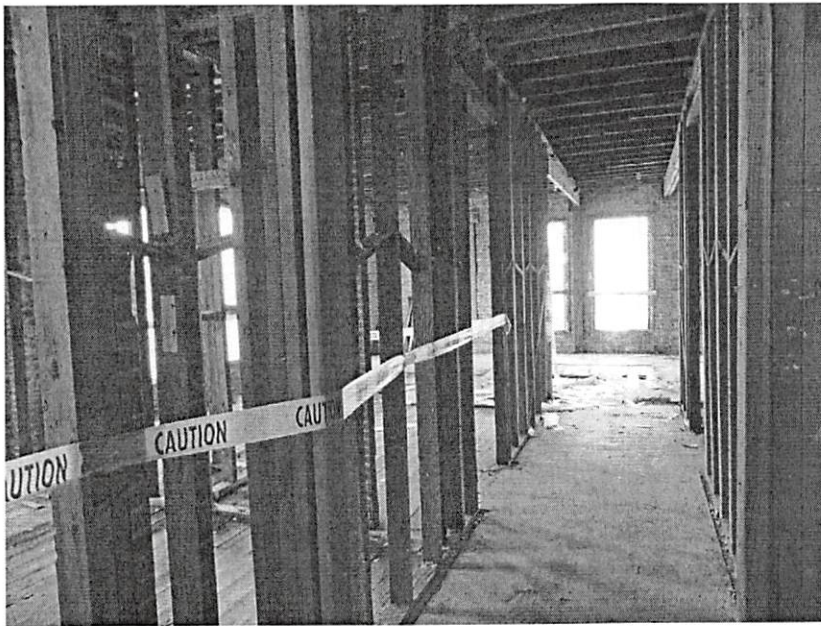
View of current conditions at third floor of the Palace Hotel with original wall framing and hallway/room configurations
